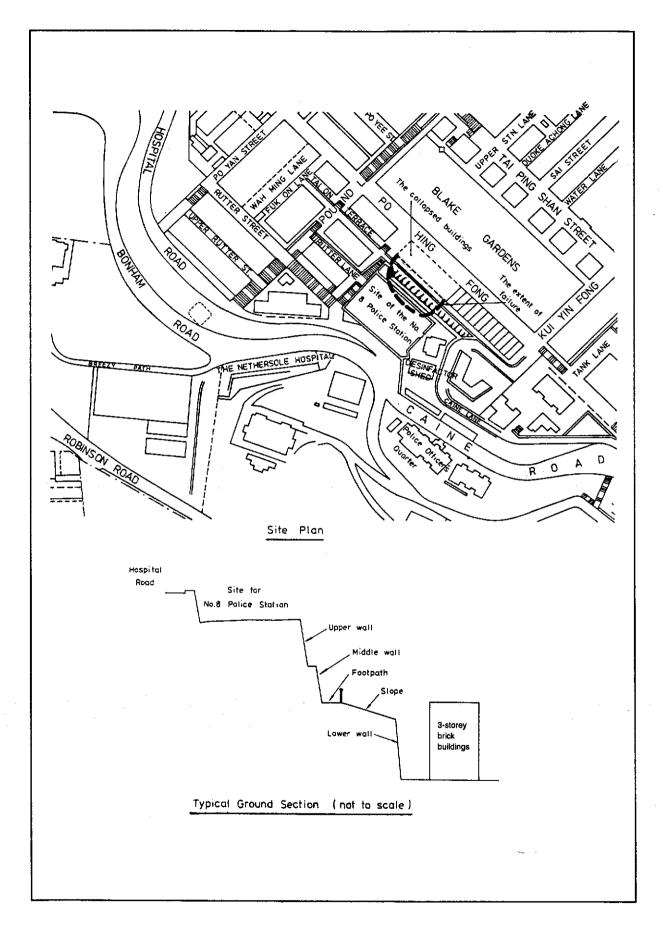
Retaining Wall at Po Hing Terrace - Site Plan and Typical Sections
